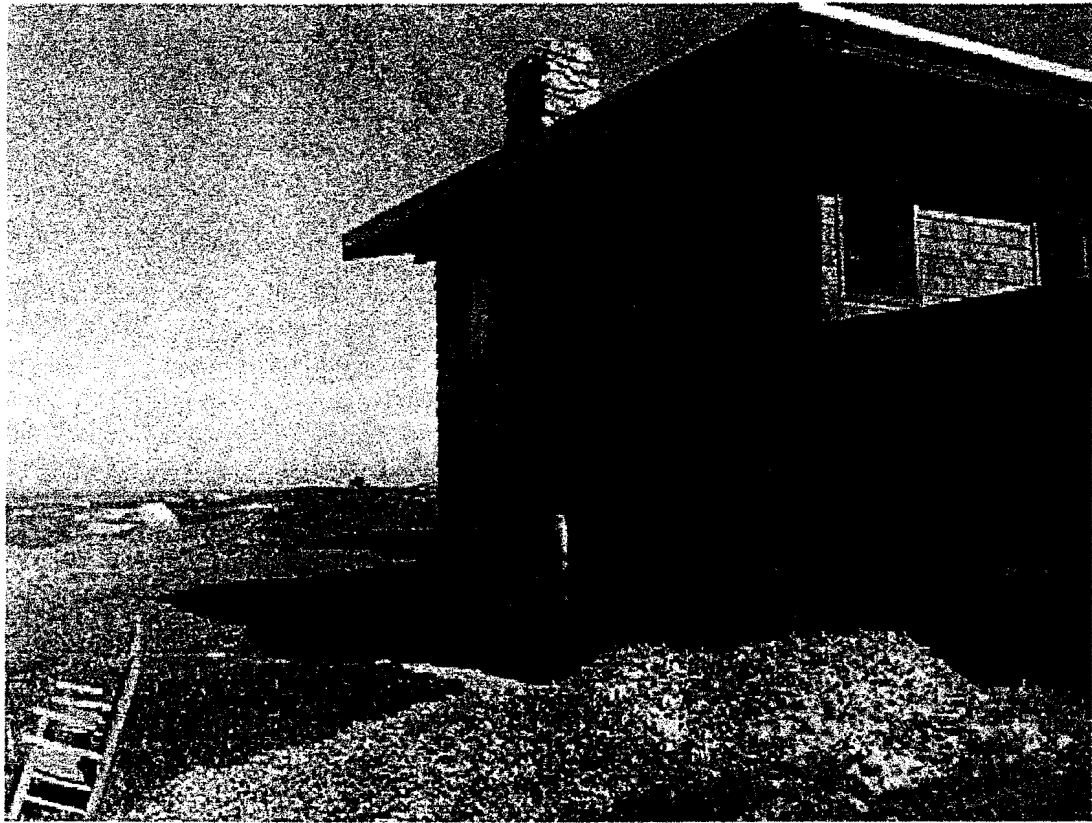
View of west face of existing Wilde residence (looking north). Upper portion of chimney has separated from wall. Decomposed granite extends approximately 6 feet from house.
